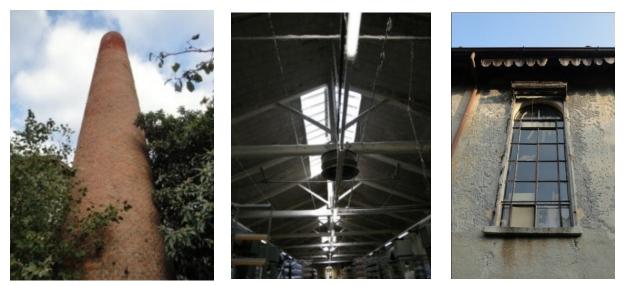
Building main features i.e., (Chimney, wooden truss and canopy)
